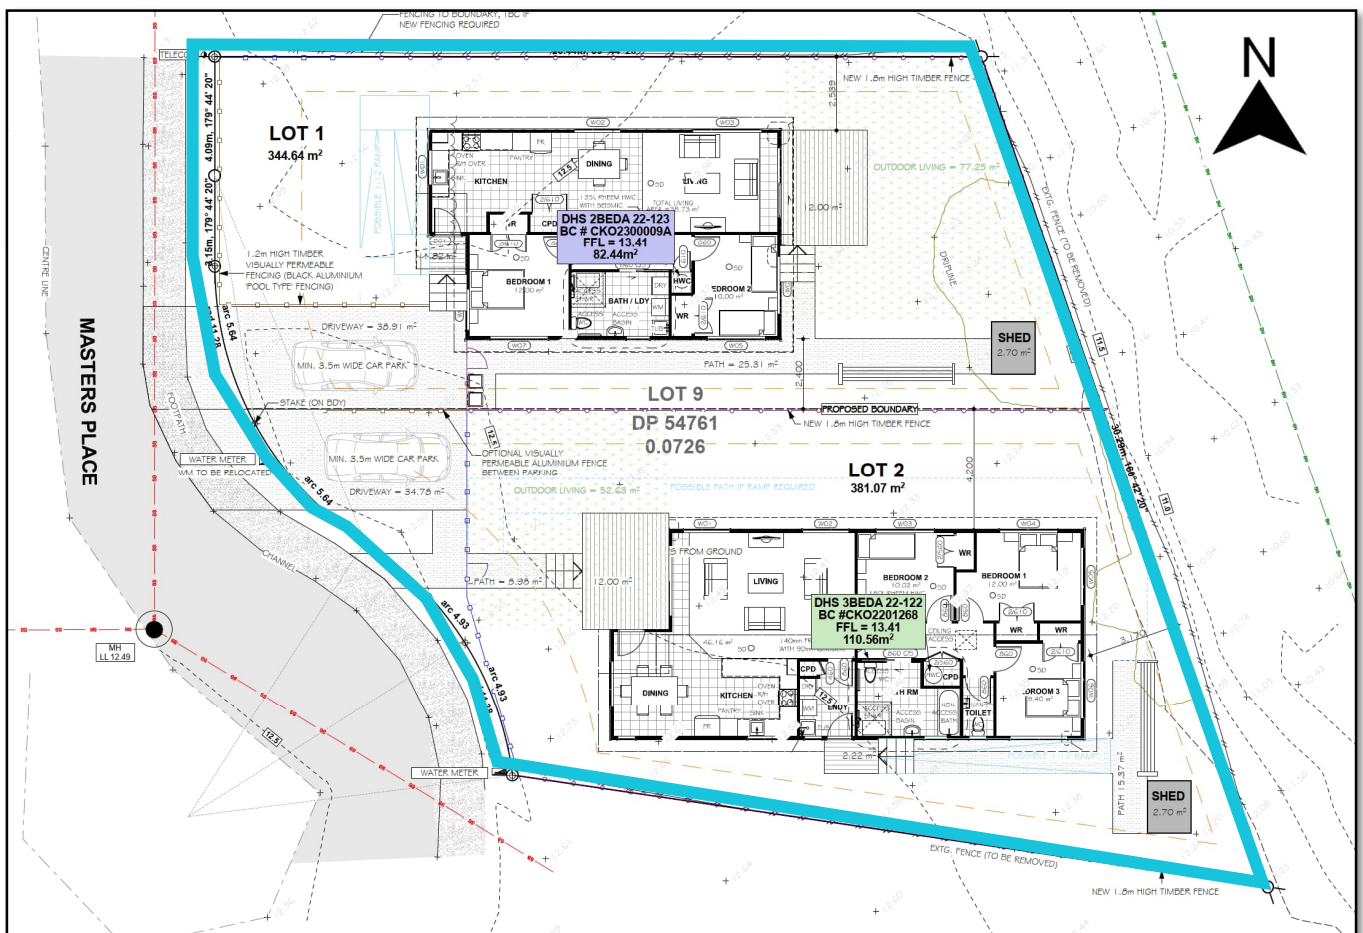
Proposed site plan, cyan colour represents the whole site boundary. Source: CTM Architectural Ltd.
